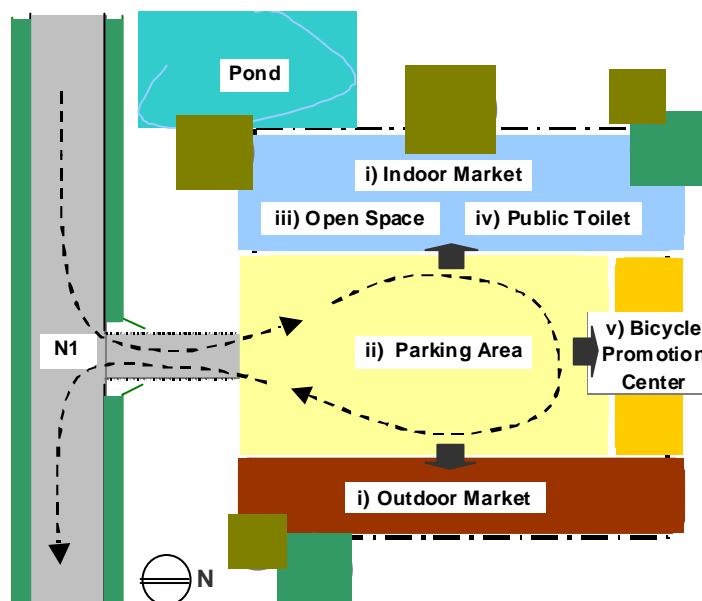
Conceptual Lay-out Plan (prepared by the Study Team)
